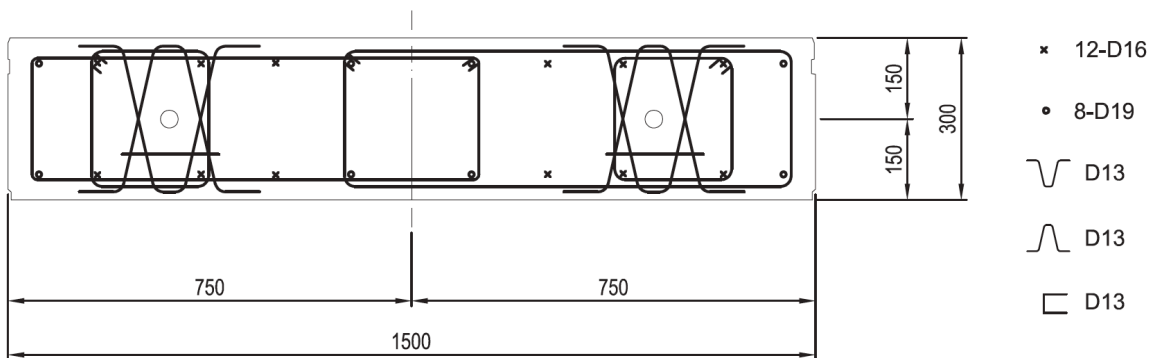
Typical reinforcement of tunnel segment (MRT Jakarta, 2015)
